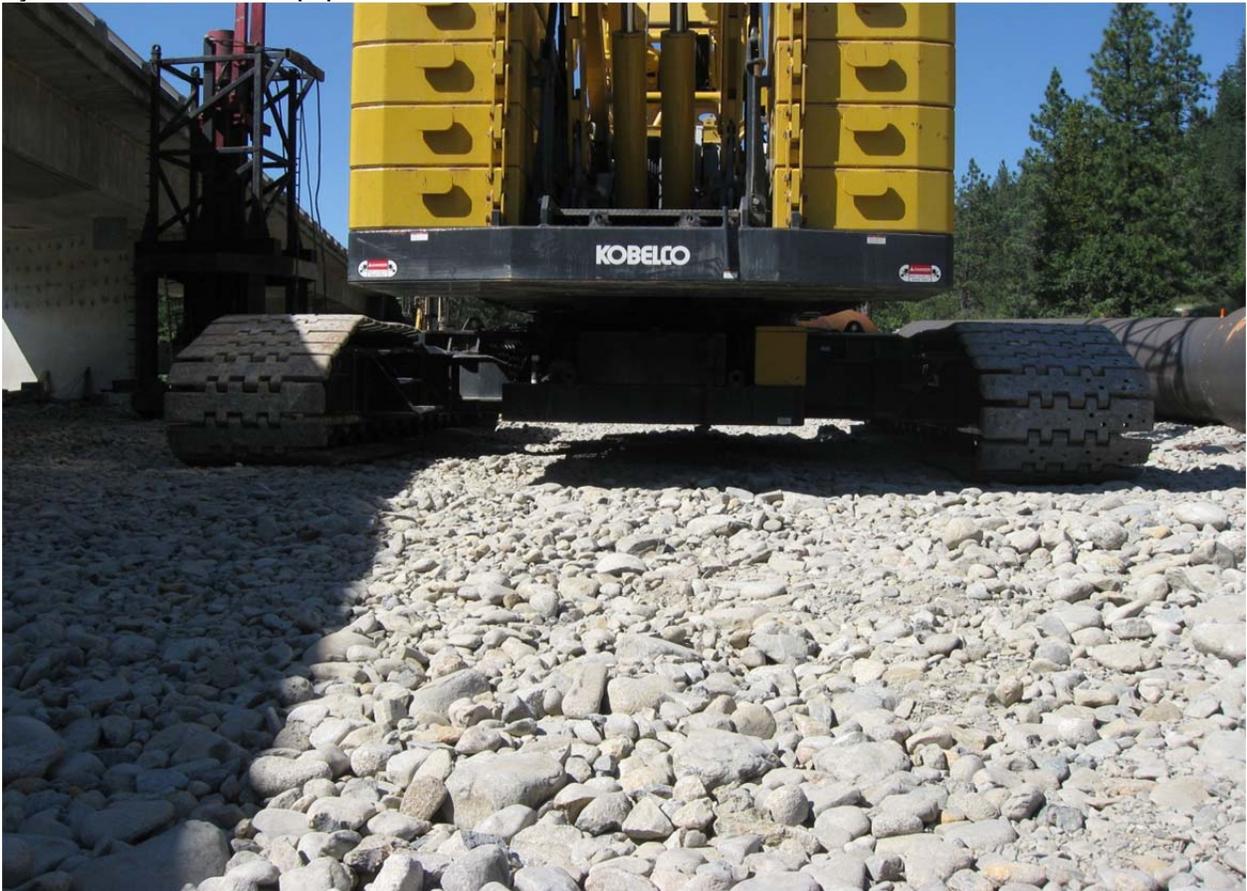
/29/11) shows an example of sediment discharged throughout the gravel bar at the Trinity River Bridge.
